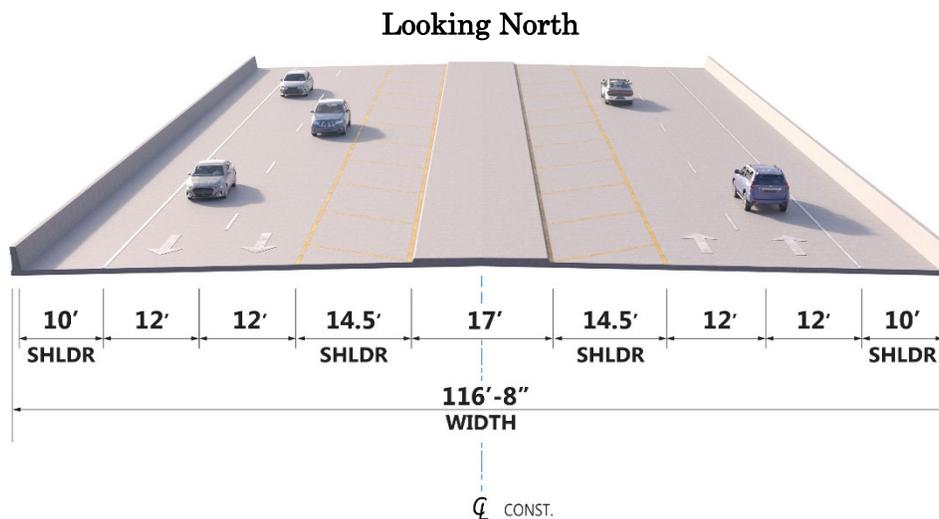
Proposed US 41 over SR 54 Bridge Typical Section
